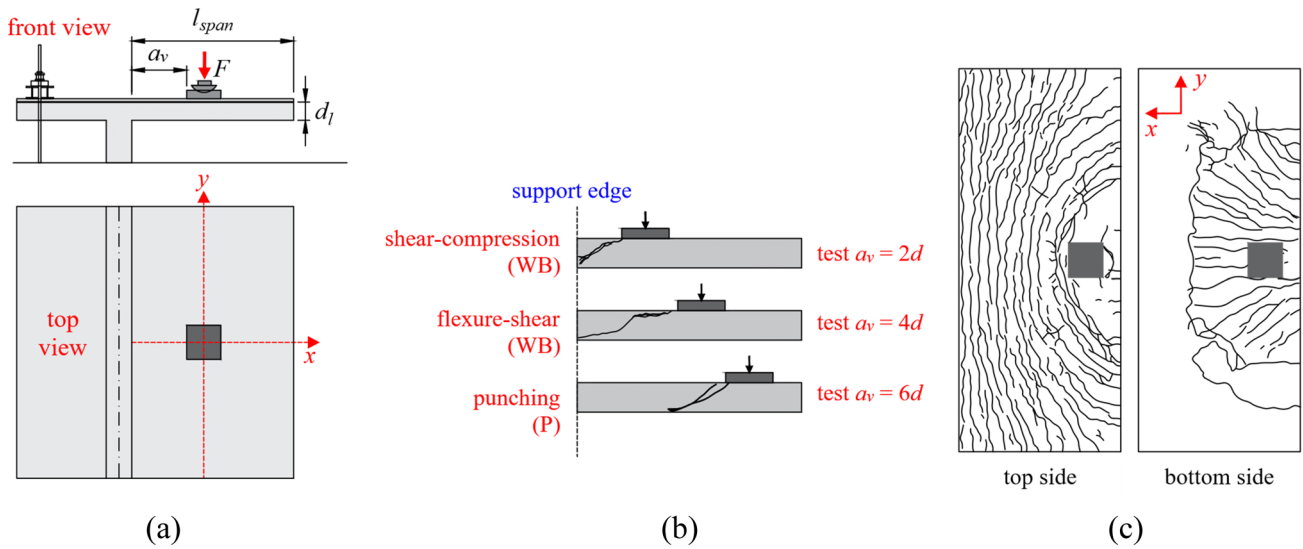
(a) Test layout; and (b) cracking pattern in cut view of slabs tested by Henze et al.⁵; and (c) cracking pattern at top and bottom side of test $a_v = 6d$.
